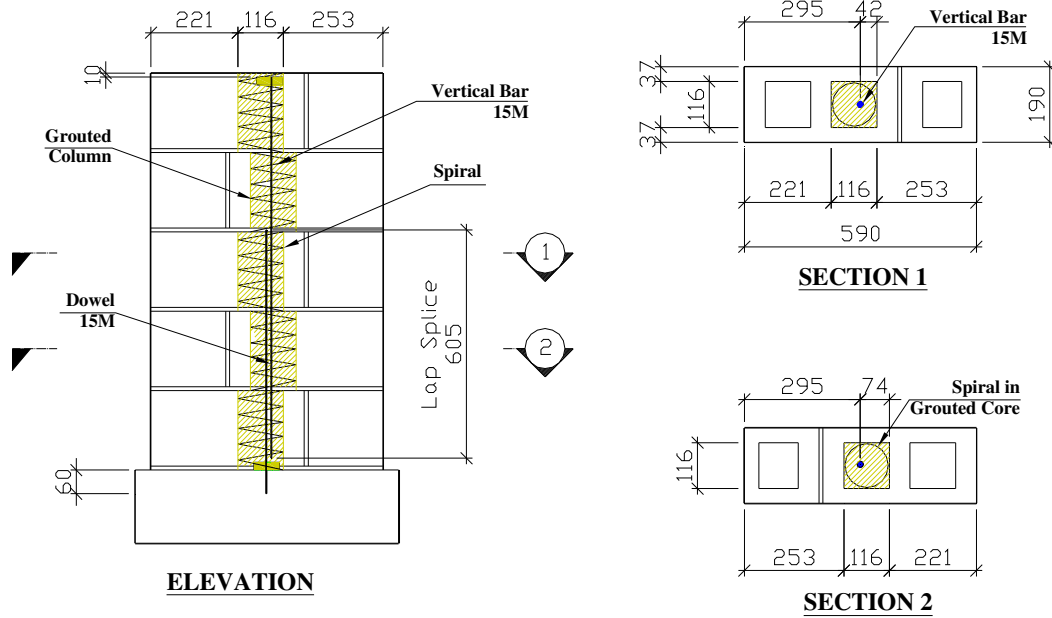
Type *C* wall test specimens (Dimensions in mm).
